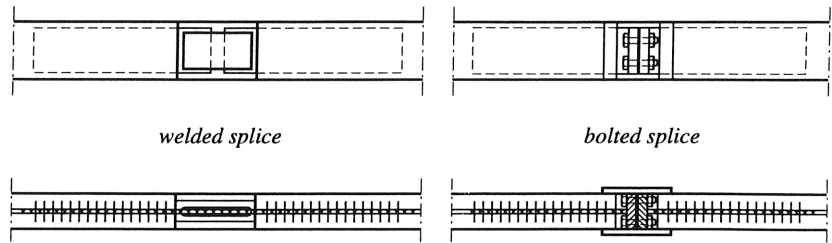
The building site splices of MNC Kerto-LVL-trusses.
